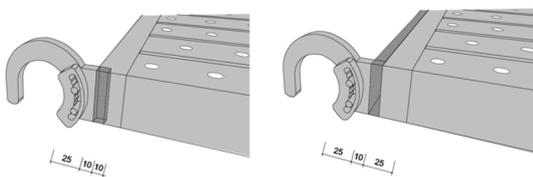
Safety fixing hook to minimize the space between steel bar and work plate.
